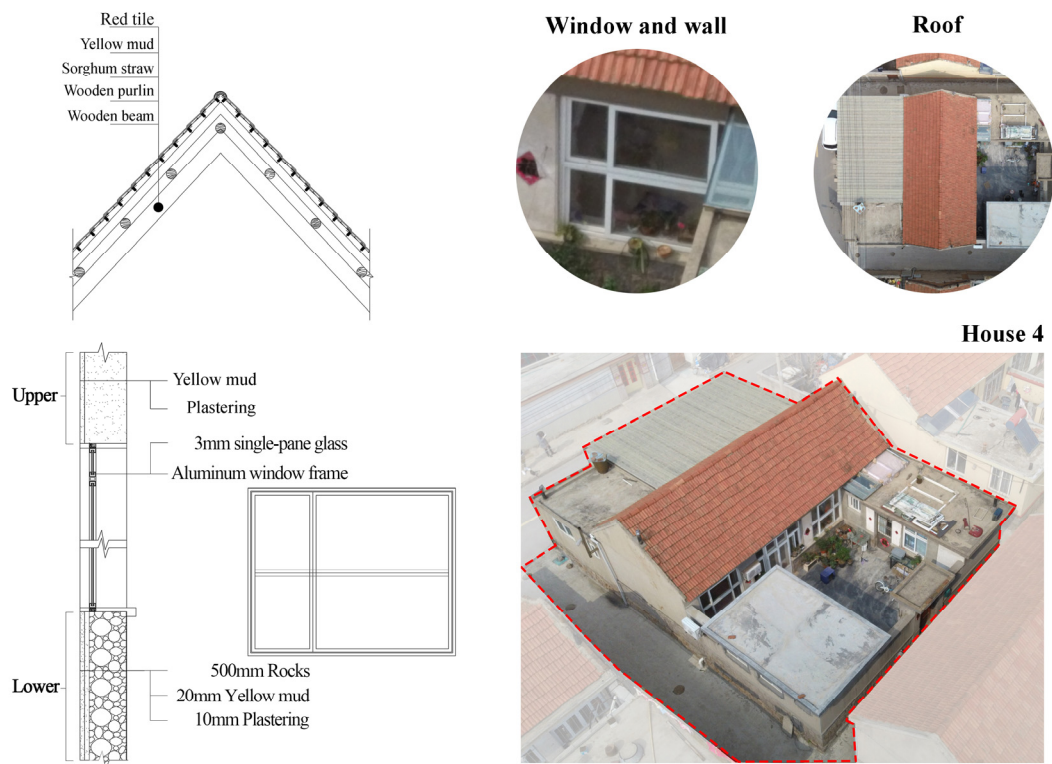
The roof, exterior wall, doors and windows of house 4
